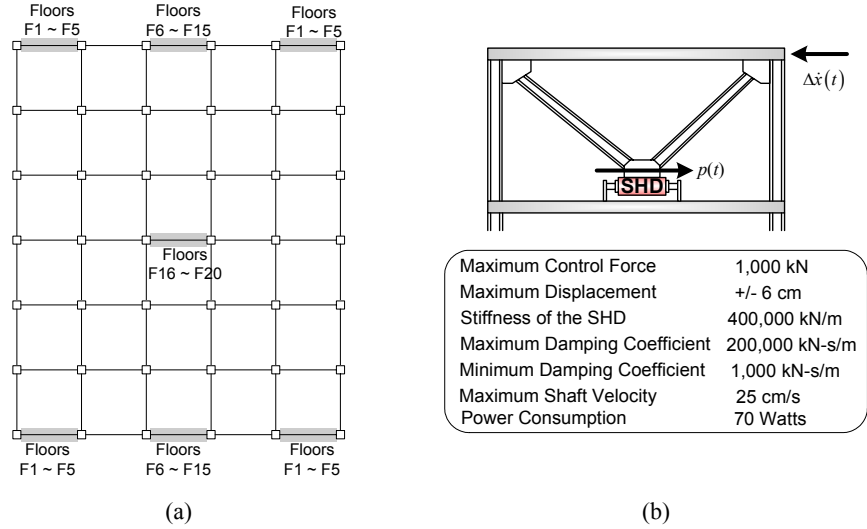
Instrumentation of semi-active hydraulic dampers (SHD): (a) layout of SHD dampers on the floor plans; (b) key parameters of the SHD damper.
